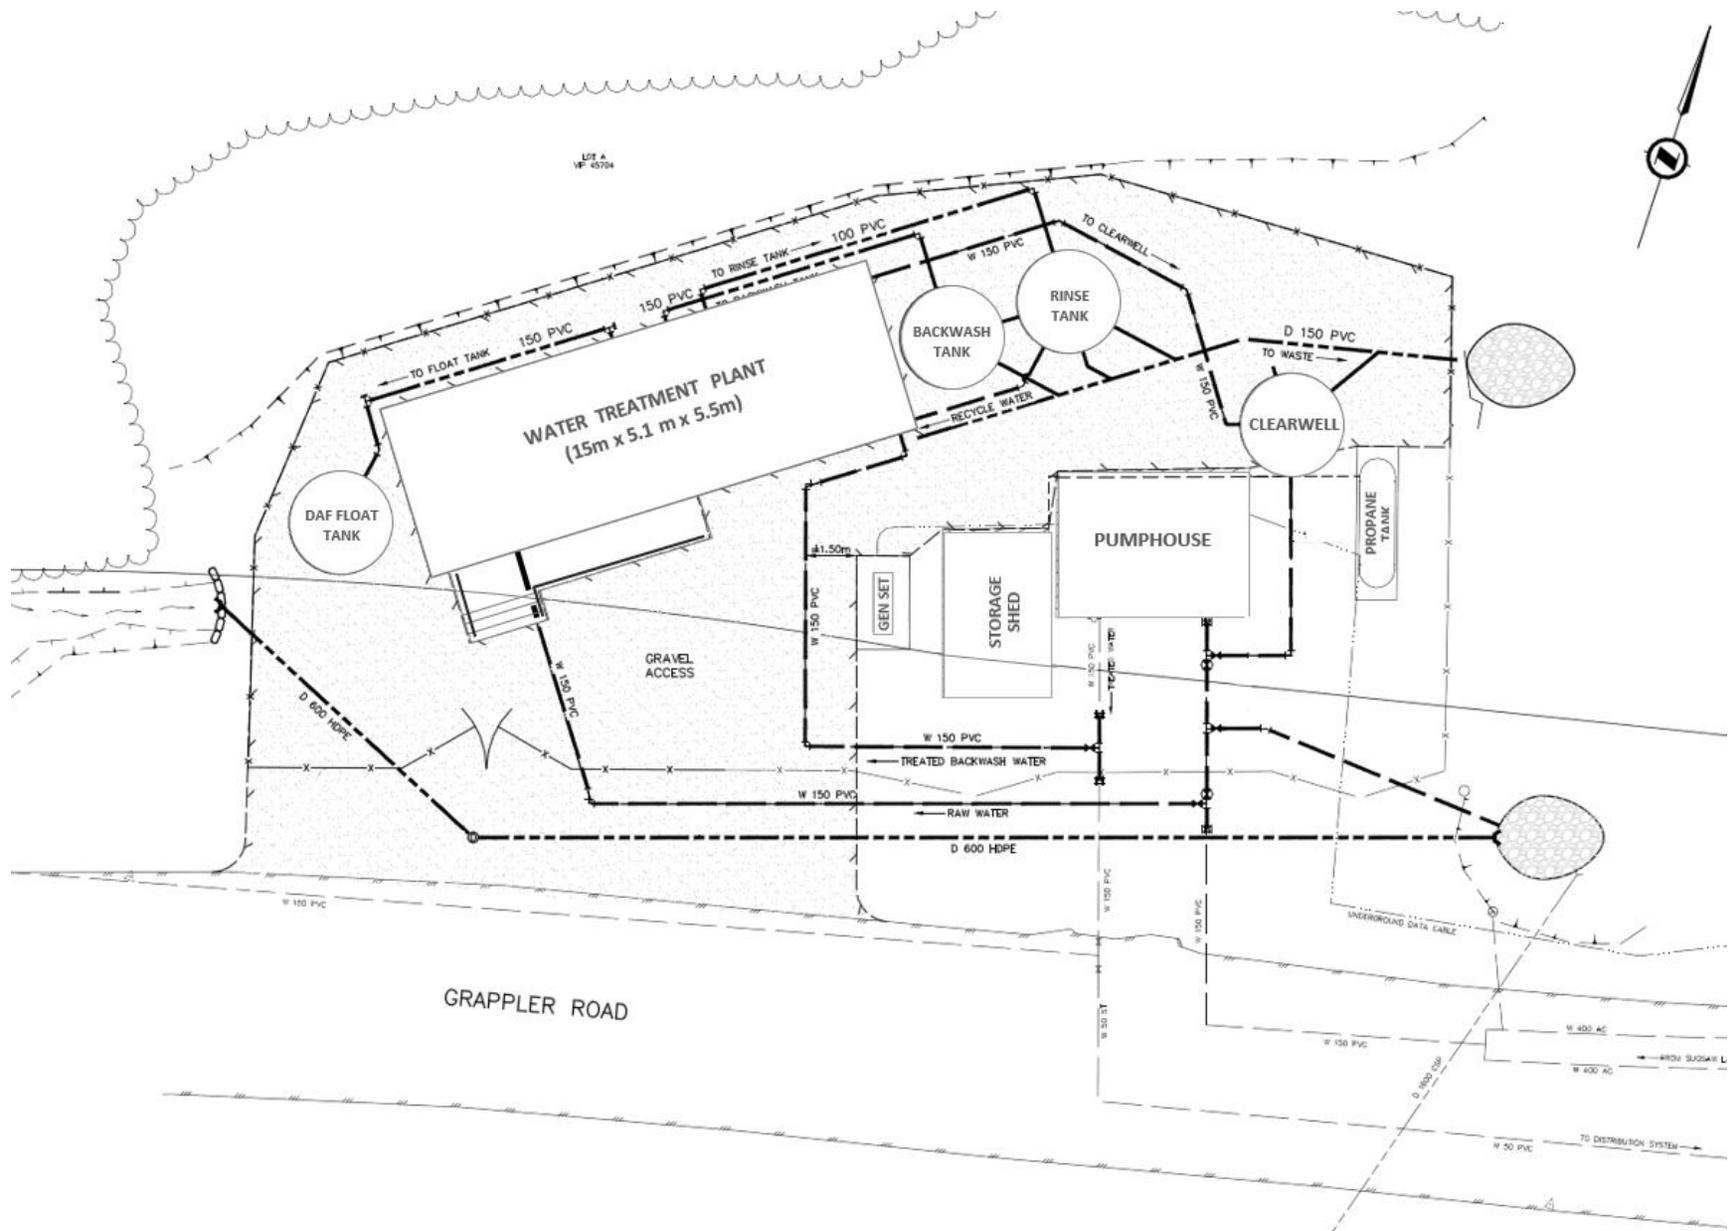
Water Treatment Plant and Pump Station Site Layout Plan
